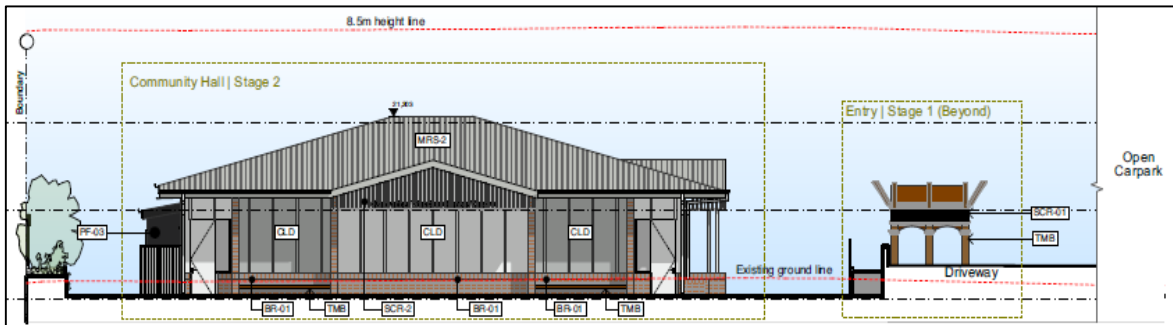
Proposed Plan of Development – Entry and Temple Elevation
